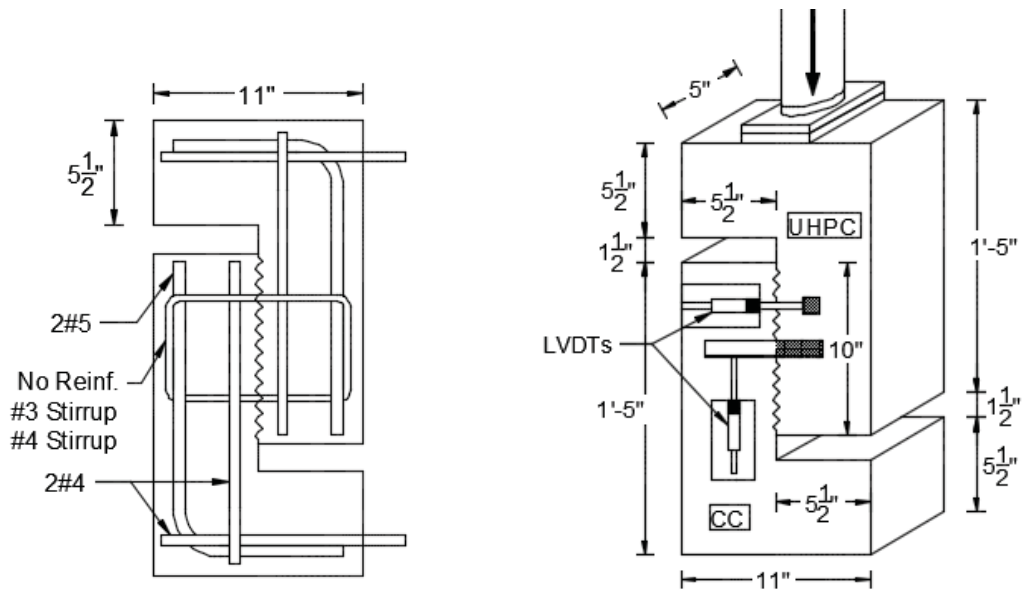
L-Shape Push-off Specimen Details and Test Setup.
